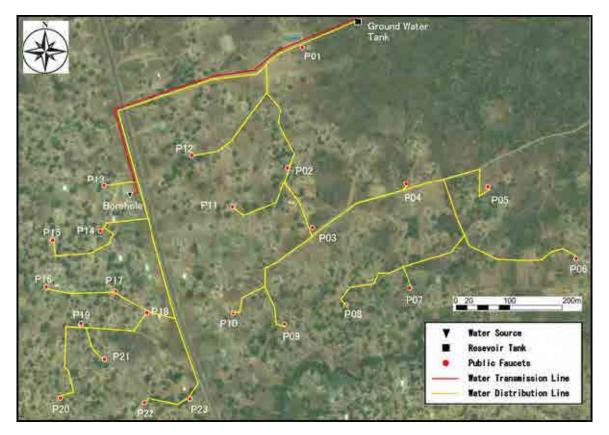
Facilities Layout Plan for Kapakala in Mwense District
